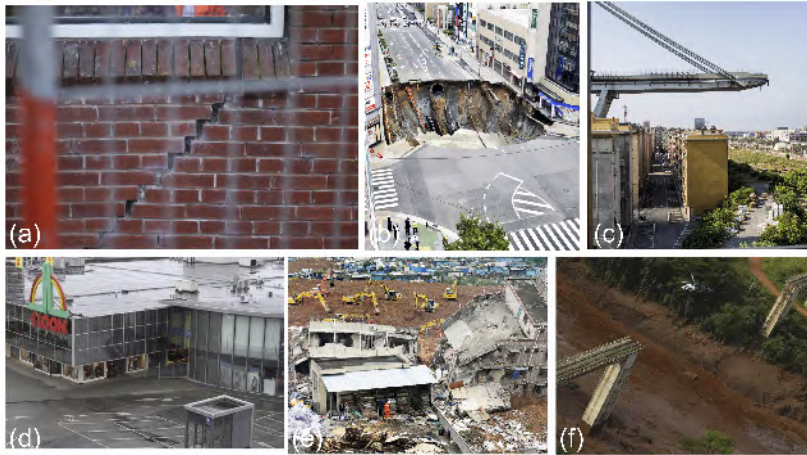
Urban disaster examples. (a) Cracks in the wall of a building in Groningen gas field, the Netherlands (Dutch News, 2016). (b) Huge street sinkhole due to the subway extension work in Japan (The Japan Times, 2016). (c) Morandi bridge collapse, Italy, 14 August 2018 (The New York Times, 2018). (d) The near-collapse of a part of a shopping mall in the city of Heerlen, the Netherlands due to upward migration of a cavity. (Chang and Hanssen, 2014). (e) The waster dump led to a disastrous landslide in the city of Shenzhen China 2015 (Wang et al., 2017). (f) Brumadinho dam collapse in south-eastern Brazil 2019 (BBC News, 2019).
